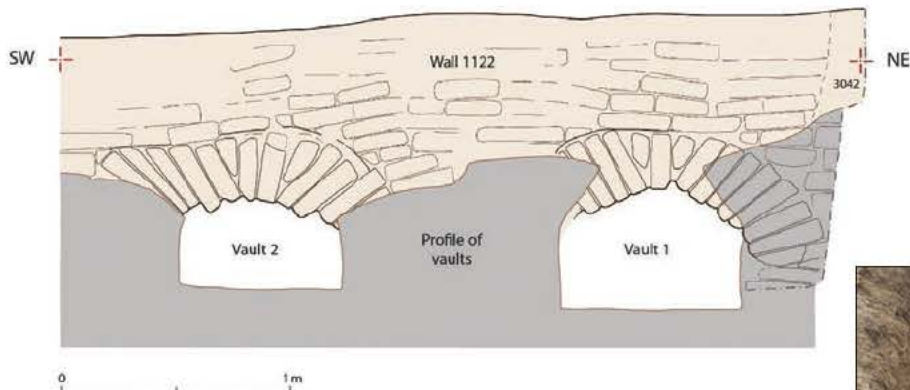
Elevation of arches built into the courtyard wall with the profile of Vaults 1 and 2 overlaid (NW).
